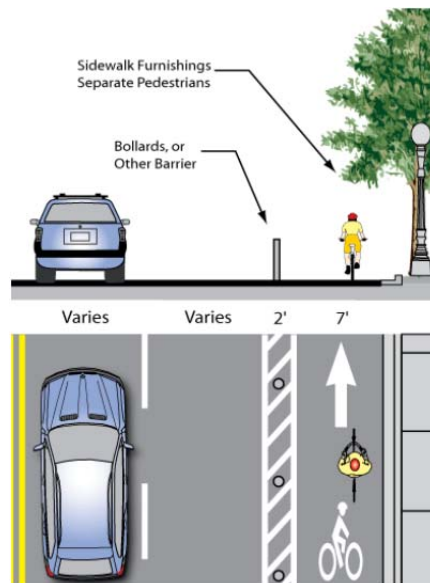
Cycle Tracks with No On-Street Parking (source: Alta Planning + Design, 2008).⁴⁰
